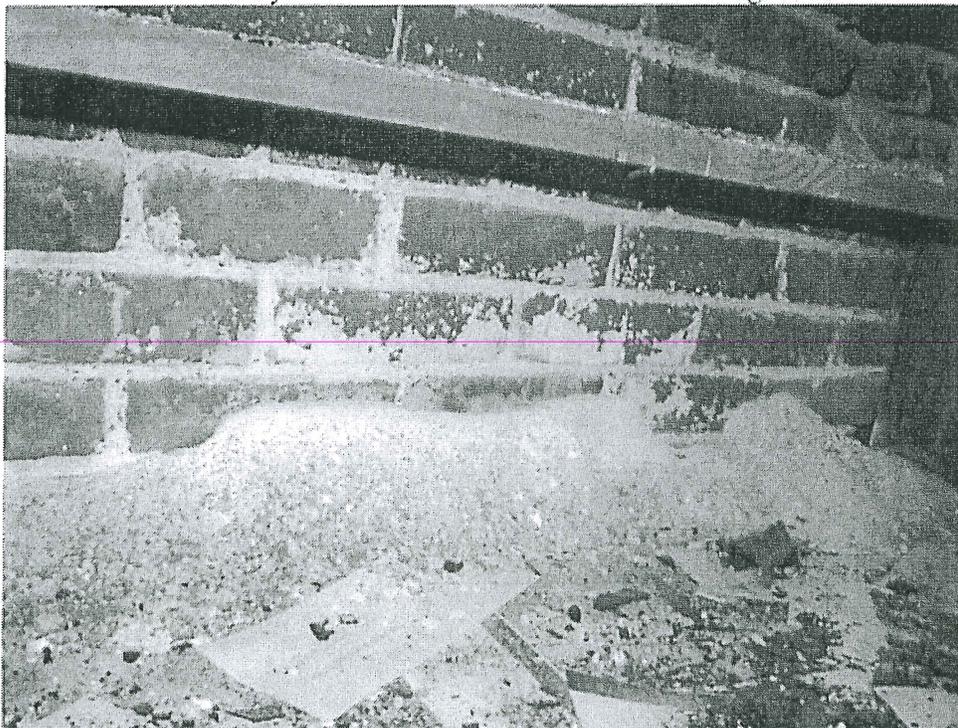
View of mortar loss above the fourth floor (interior)
